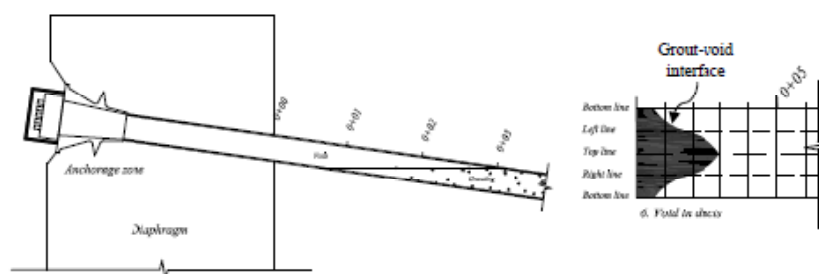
Marking Voids on the In-Depth Inspection Form.
